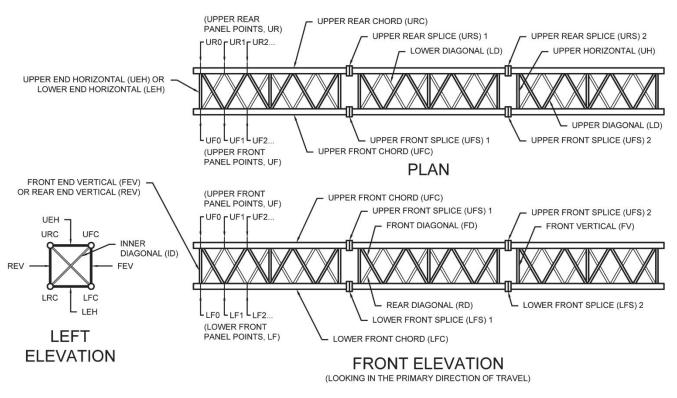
Methodology for Panel Point Numbering and Component Labeling of Four Chord Truss Overhead and Cantilever Sign Structures with Splices
